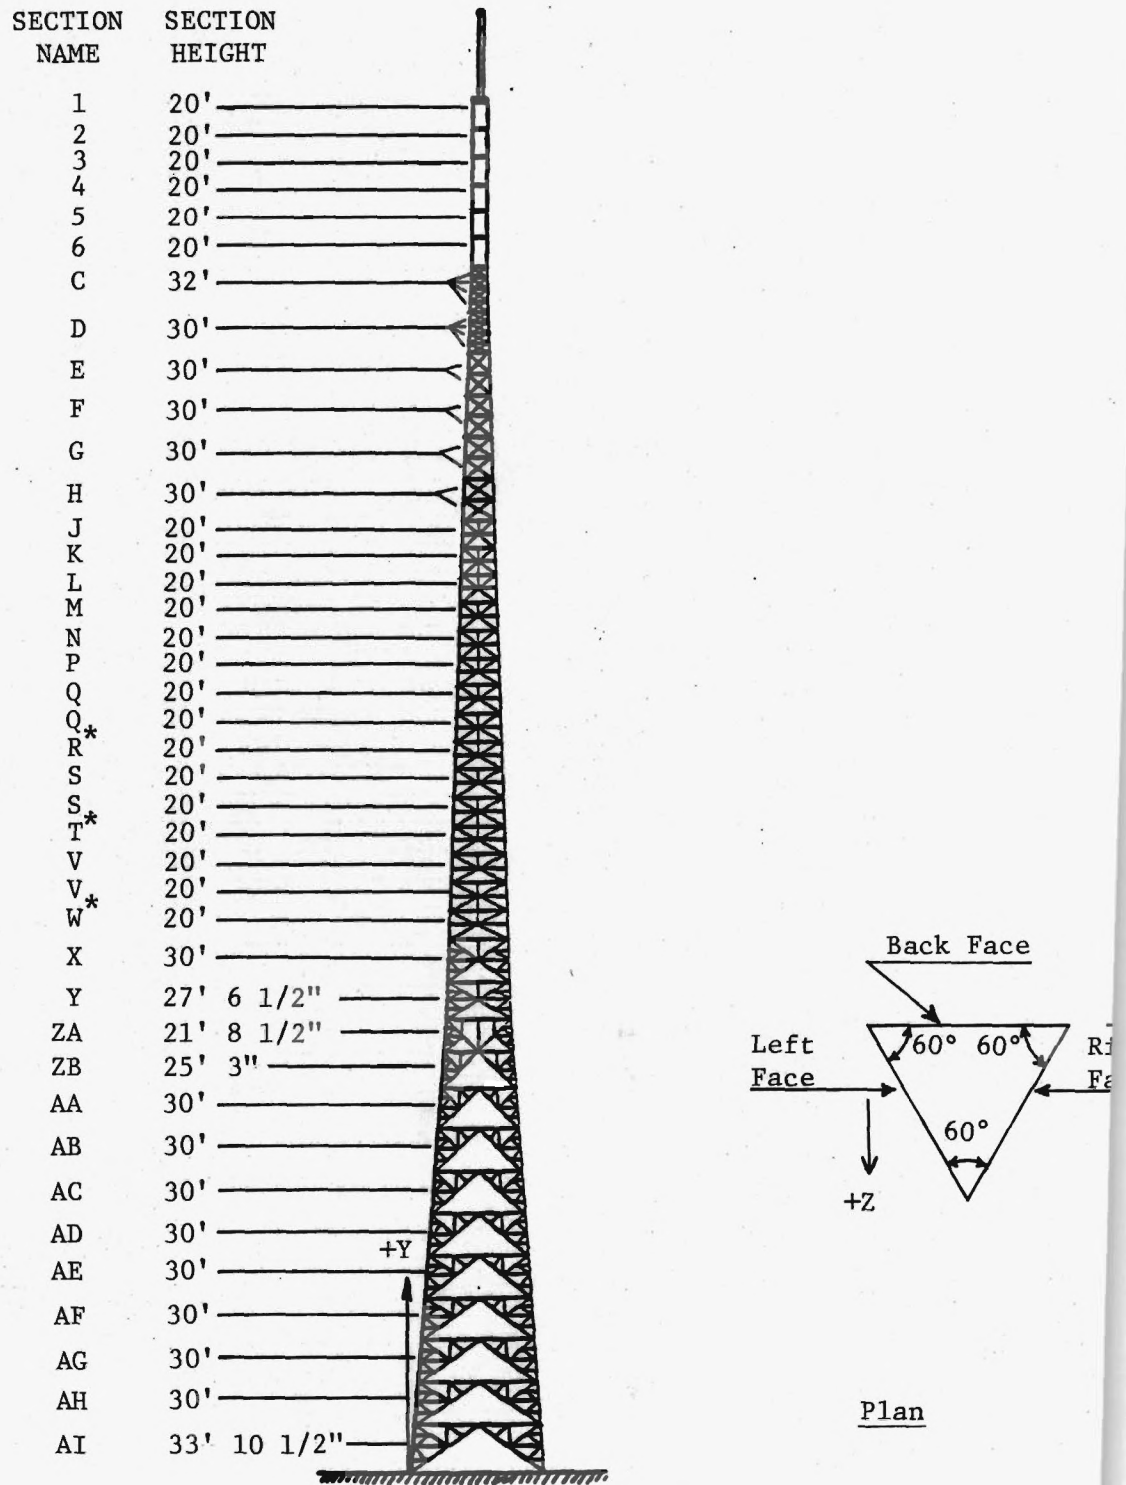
Prototype Structure. Elevation and Plan View with Coordinate Axes.
